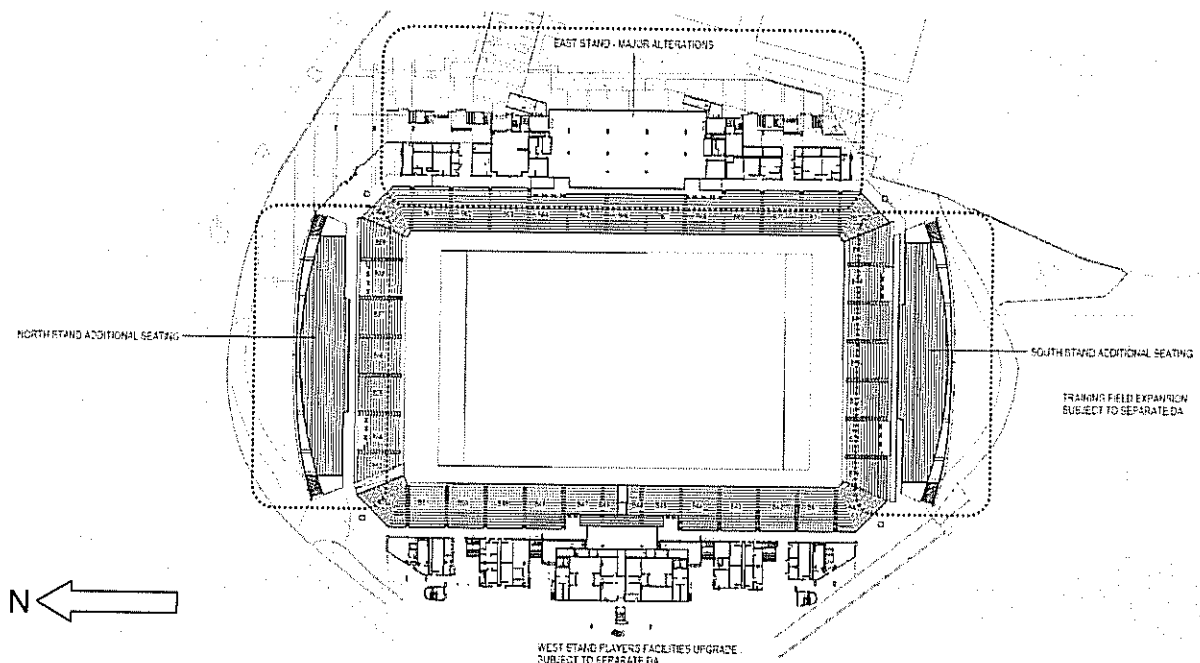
Proposed works at the northern, southern and eastern portions of the site.
